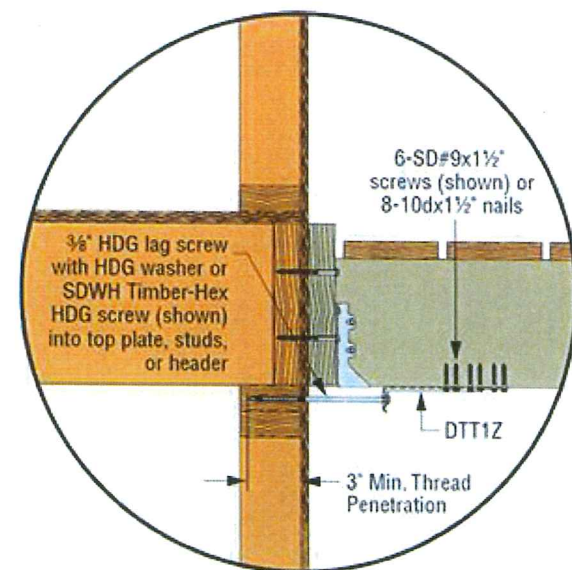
LedgerLok Ledger Board Fastener Deck Connection
